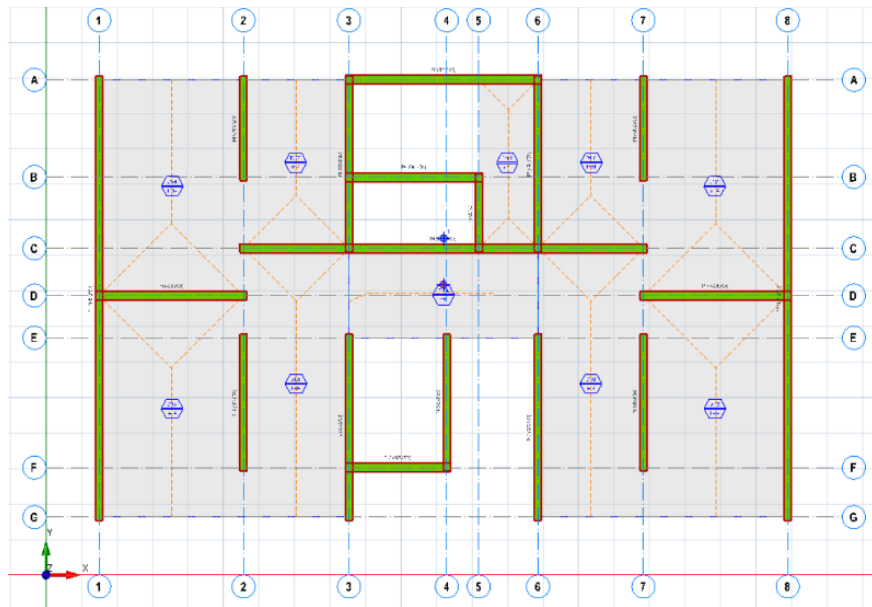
Floor Plan of RC10 Model in ProtaStructure
